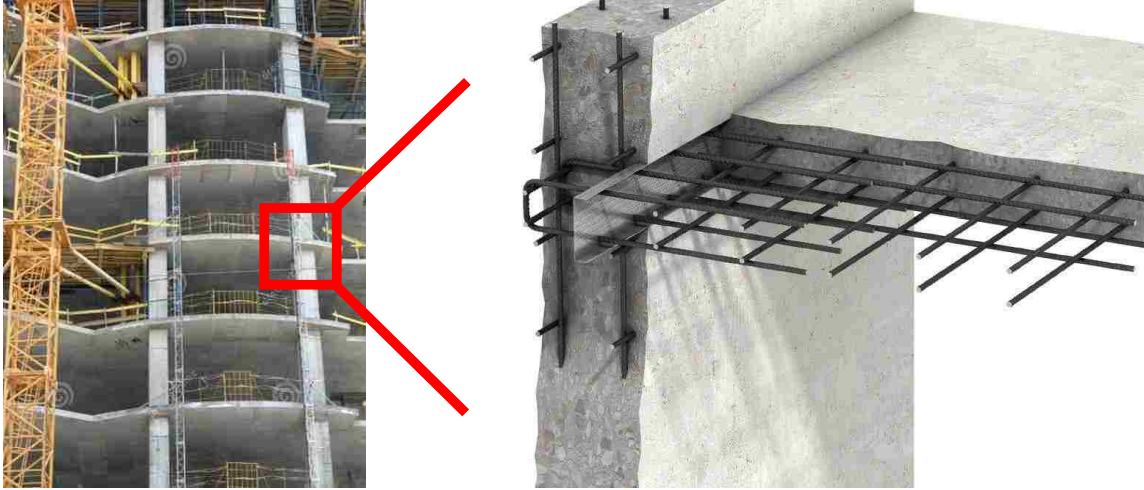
Reinforcement bars inside a concrete structure.
